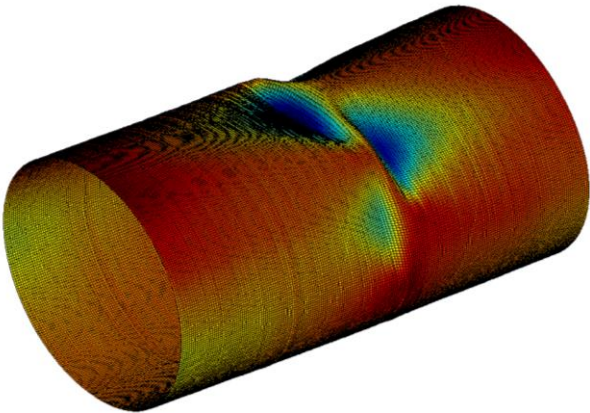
3D image of a specimen that buckled at the girth weld. Close inspection shows that both the girth weld and the spiral weld to the lower right of the girth weld are visible.
